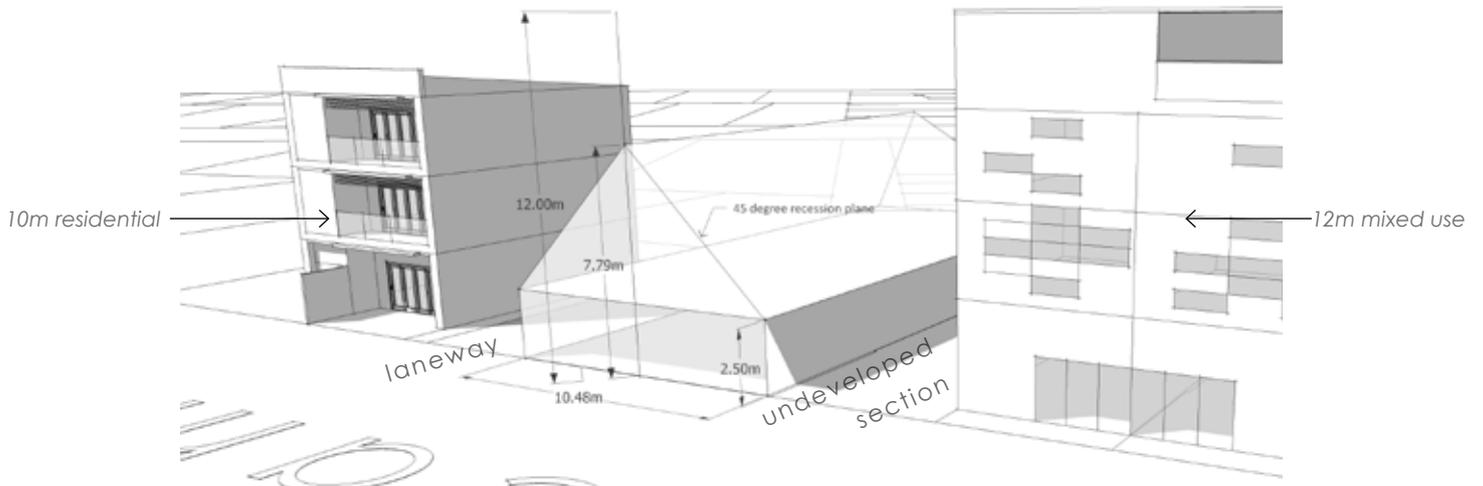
EXISTING RECESSION PLANES WITH THE REMOVAL OF THE STREET FRONTAGE RECESSION PLANE
